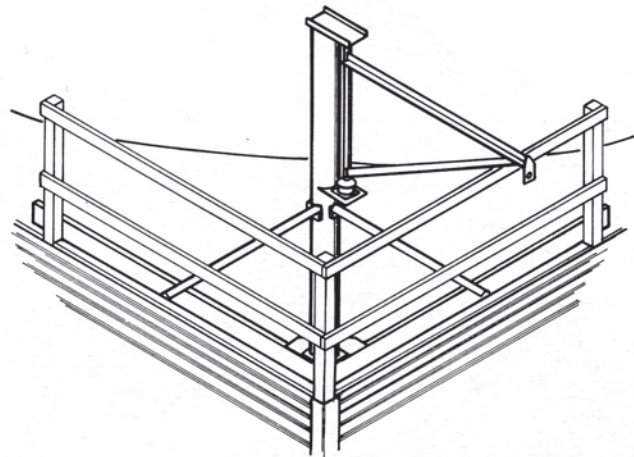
Towers of intermediate size use endwall davit for servicing and handling mechanical equipment.
